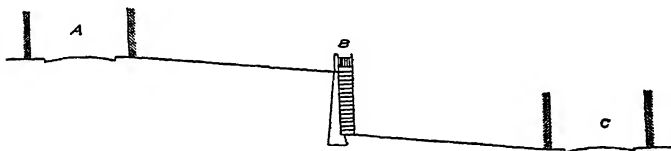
CROSS STREET WITH BROKEN GRADE.
